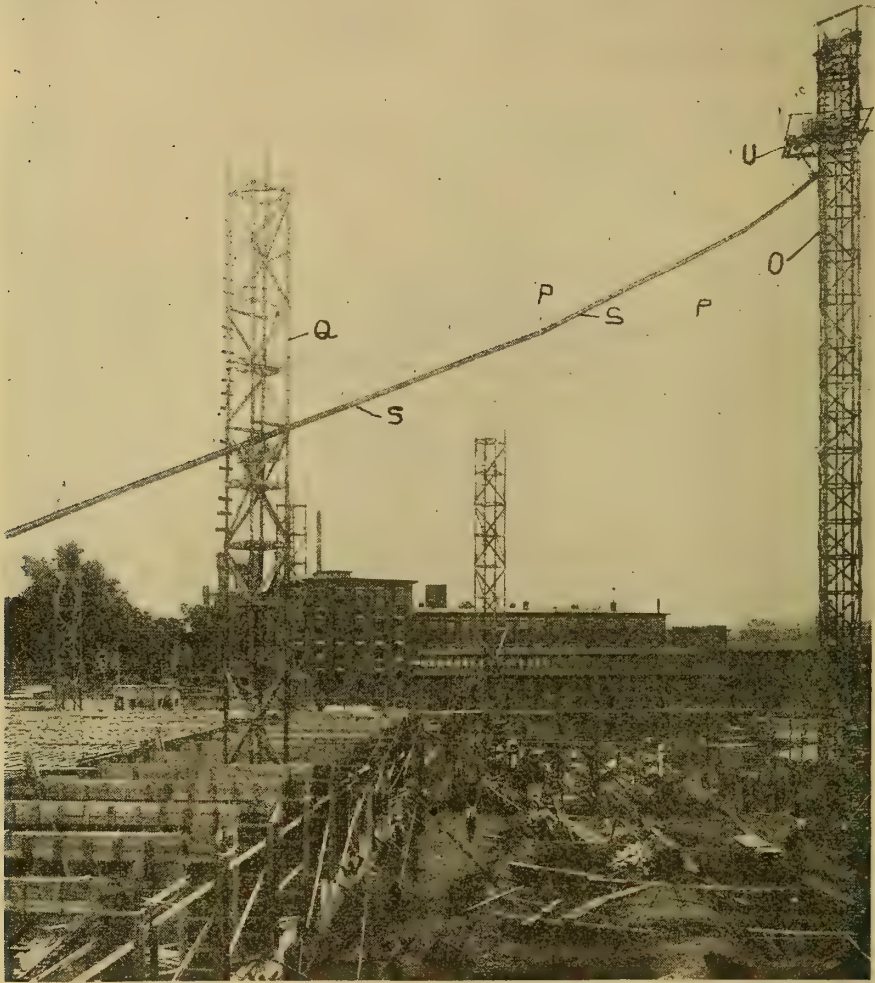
View Taken About 10 Days Before Fig. 164 Showing Towers for Handling Concrete.
